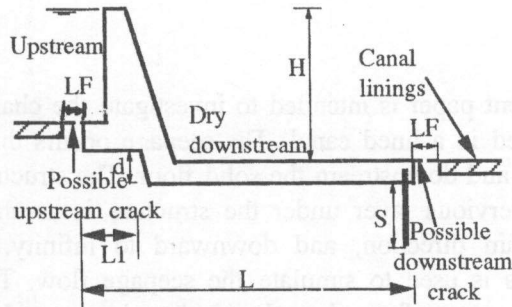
Definition sketch for a clear overfall weir provided with a single drop and a sheet pile at the downstream edge of the floor and constructed in a lined canal.
